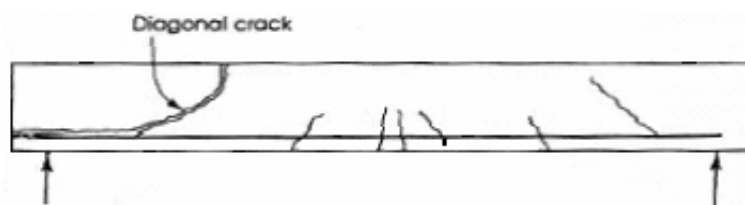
Shape of the beam 1 at shear failure, from Nadim Hassoun (2002).
